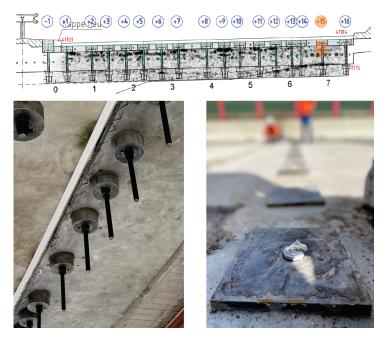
Cross section of the punctual pt bar systems (*top*); HA Plates below the slab (*bottom left*); threaded ended Plates above the deck (*bottom right*)
